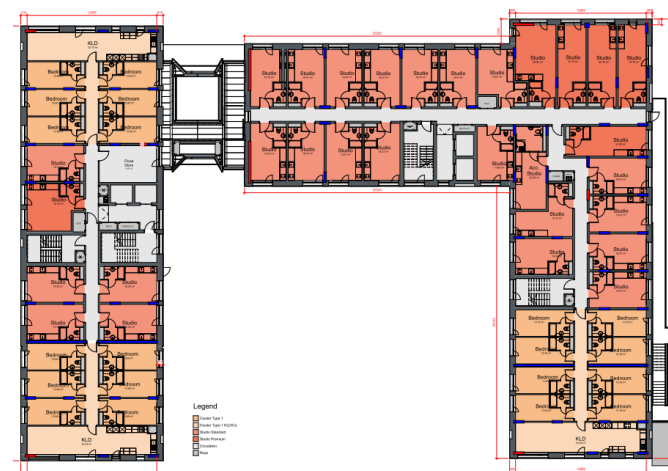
Typical residential floor plan (Source; Chapman Taylor 1st floor plan)
